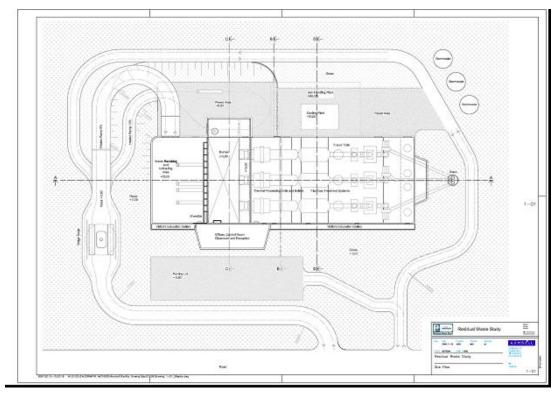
Conceptual Plan of a Thermal Treatment Facility
